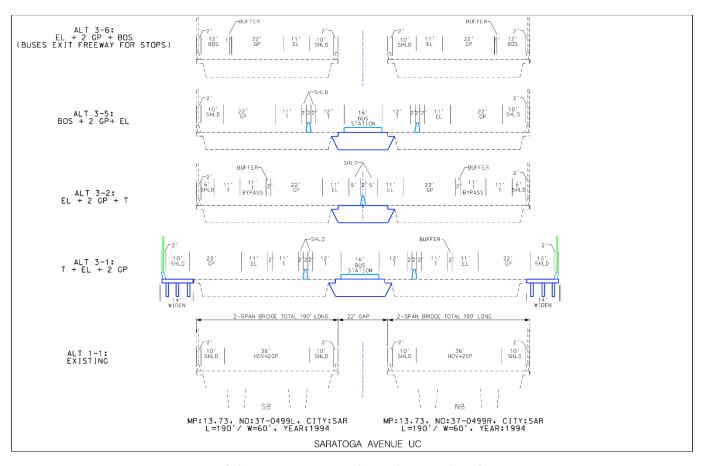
Saratoga Avenue Transit Station Geometric Cross Sections
